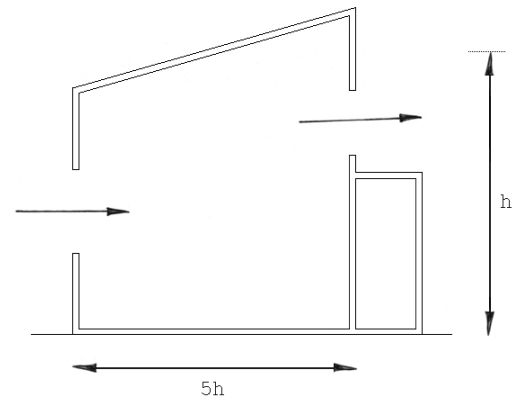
Cross ventilation, façade opening and clerestory windows.
